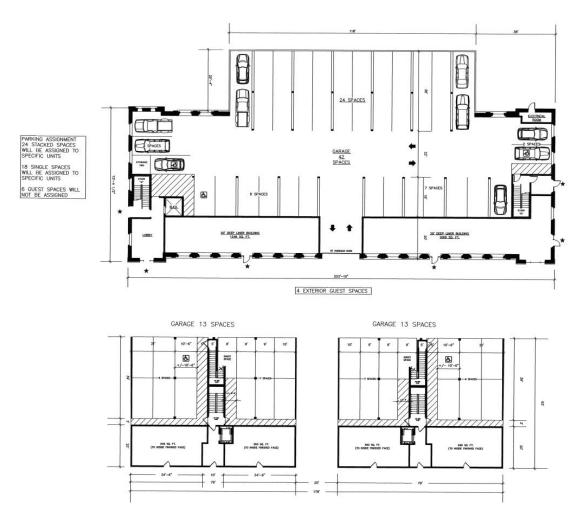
Proposed Parking Layout (72 Spaces) for the Design Review Plan
